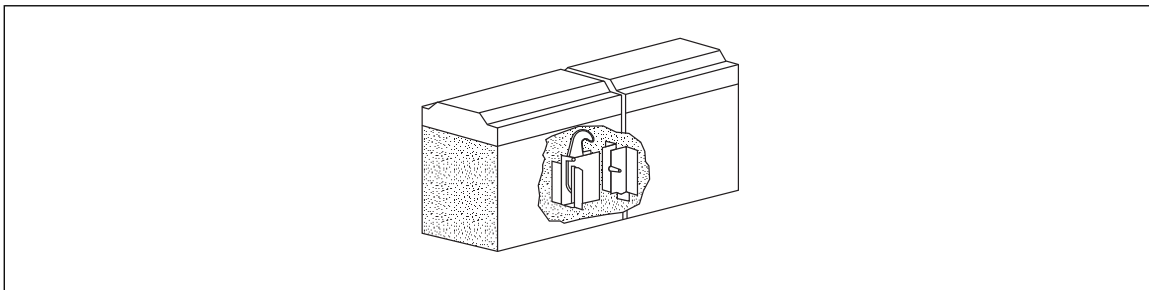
Cooler panel locking joint (Courtesy of Mid-South Industries)
